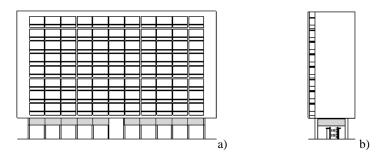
Schematic representation of TLD location on the ground floor: a) SO façade and b) SE façade.
